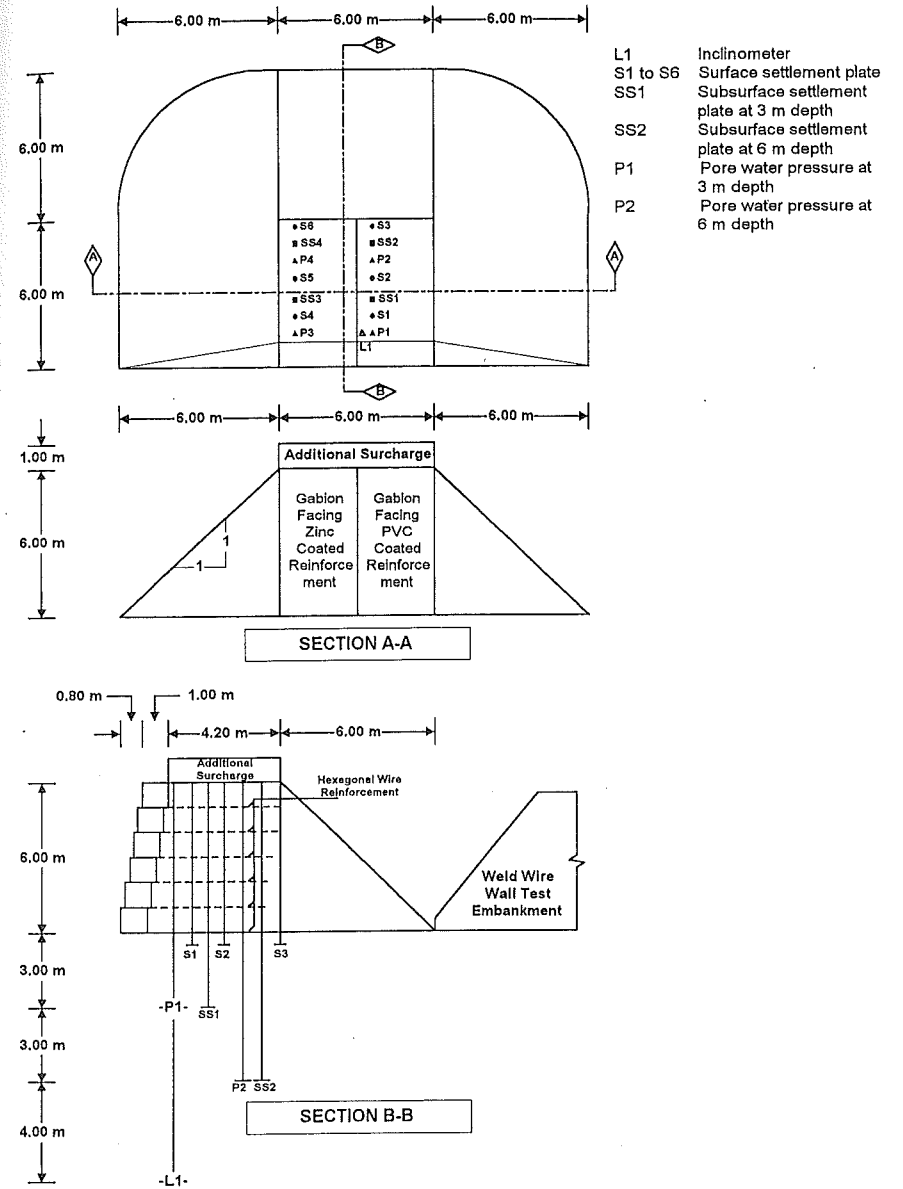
The Plan and Cross-Section of Monitoring Instrumentations
